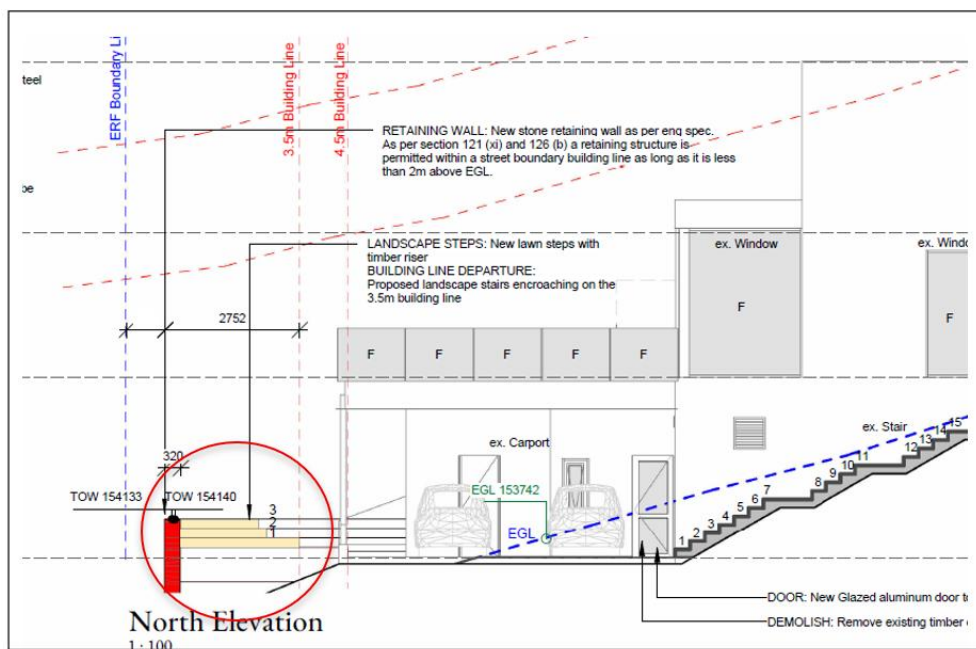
Proposed landscape steps encroaching onto the 3.5m street building line
